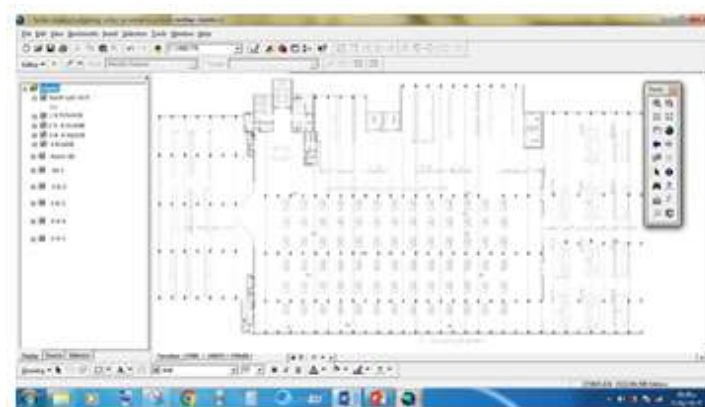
Horizontal plan of the second floor of the project, uploaded by the design engineer.
